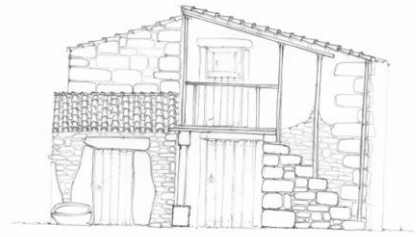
Facade of a two floors house in Picote, drawn by Joana Diogo.
